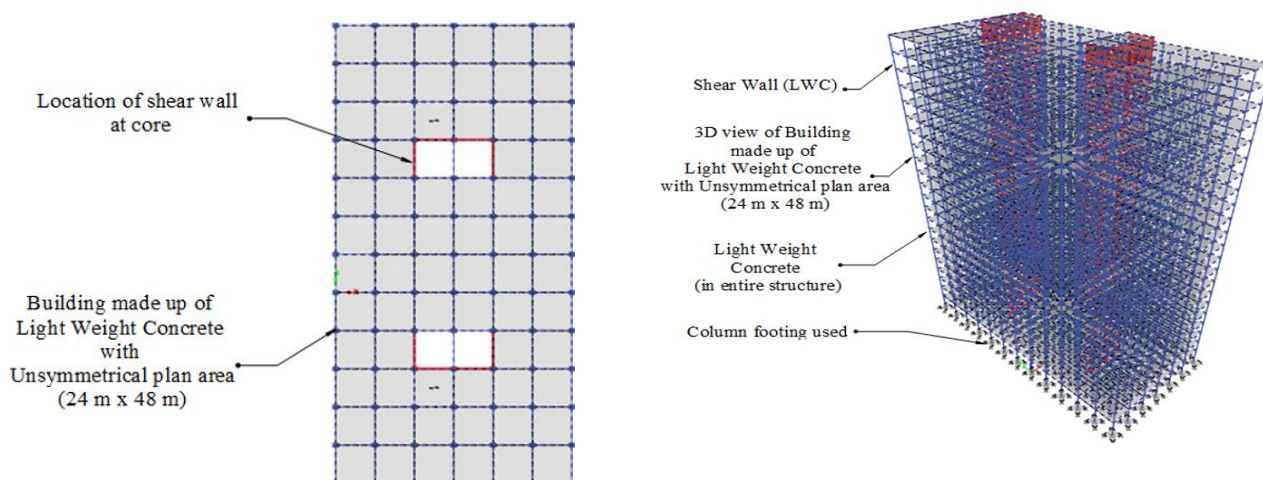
Plan and 3D view of unsymmetrical plan using Light Weight Concrete (LWC2)
